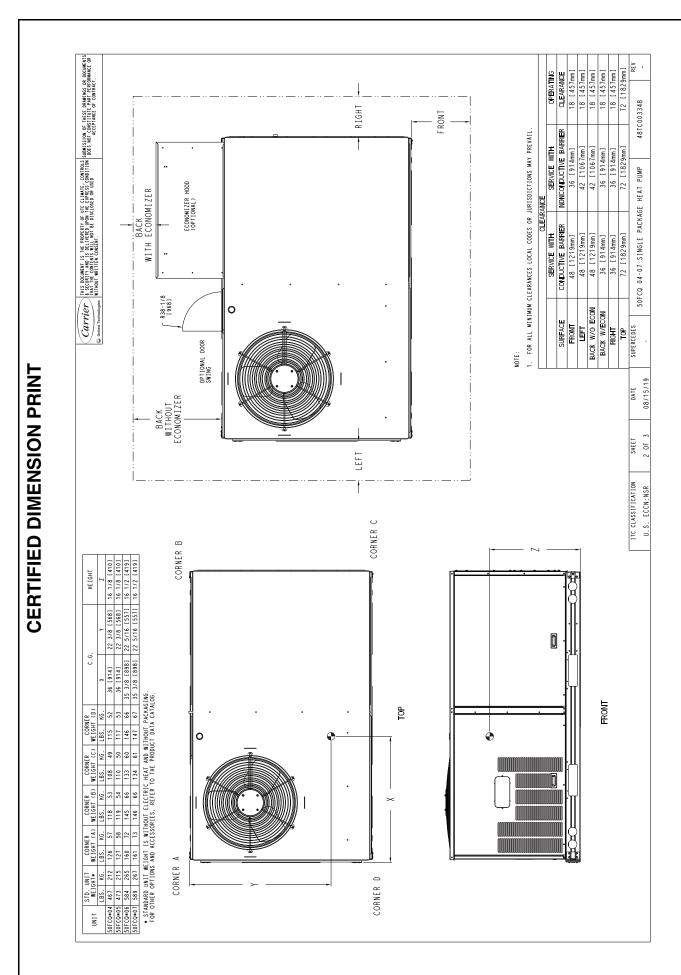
50FCQ*04-07 Dimensional Drawing (cont)
